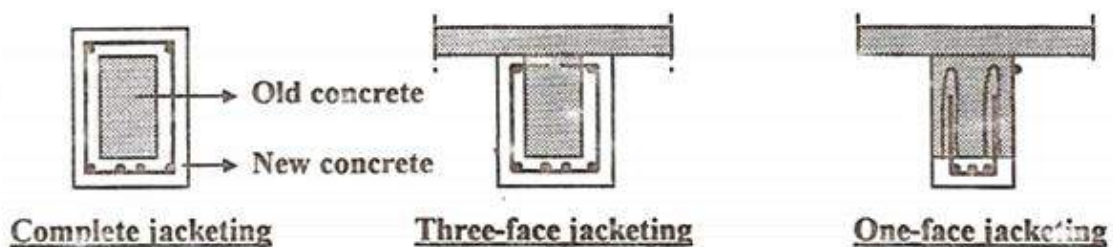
RC beam jacketing technique (Source: Ziara, 2014)
